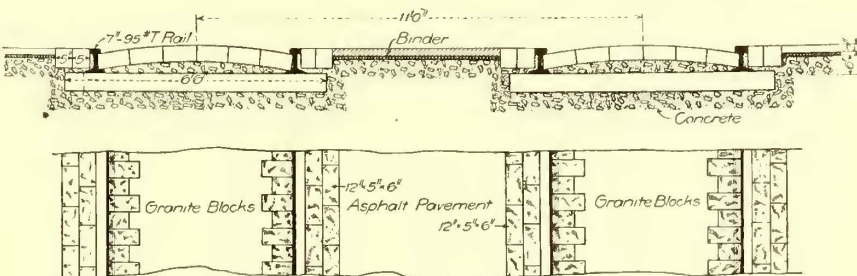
T-Rail Construction for Asphalt Paving in Milwaukee
